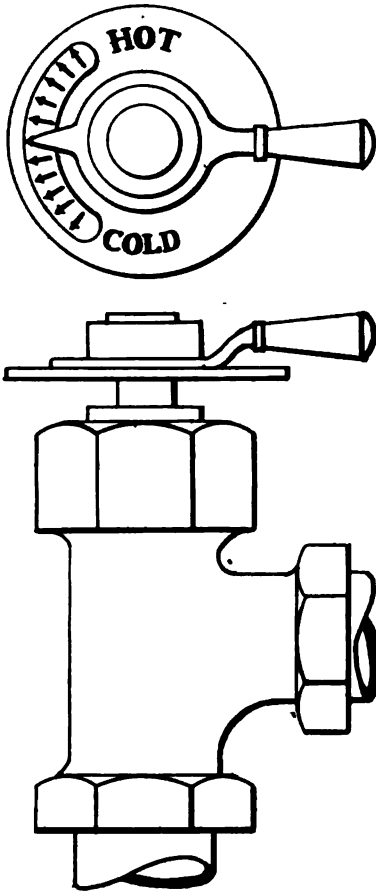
TYPICAL DESIGN OF RADIATOR VALVE FOR VAPOR HEATING SYSTEM.
